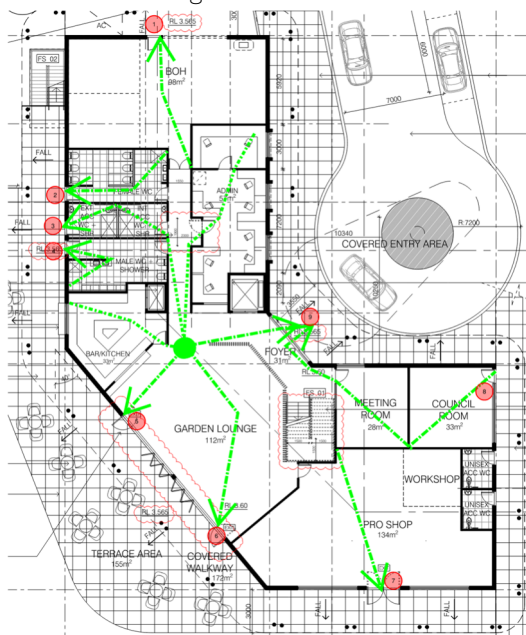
GROUND FLOOR LEVEL EGRESS
